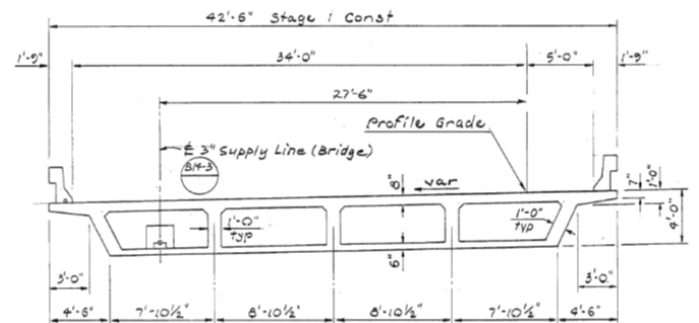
Cross-section; General plan of prototype bridge (49-0165L).
